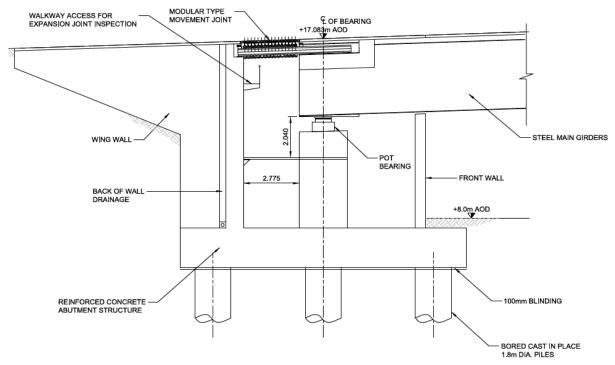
Cross section through proposed east abutment with an inspection walkway behind the bearing plinths
